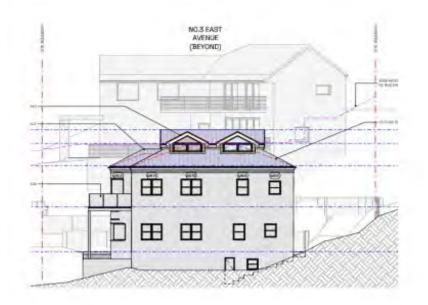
The existing Dual Occupancy as proposed sits below and is consistent with the scale of No. 3 East Avenue adjoining.
